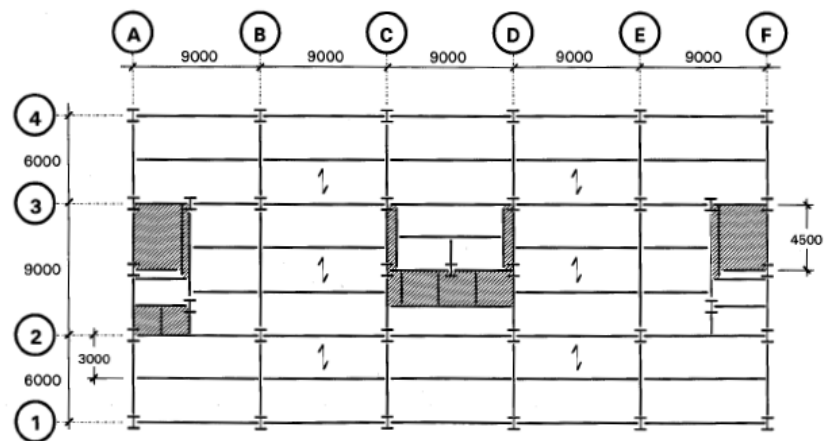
Floor layout of Cardington test (BS, 1999)
